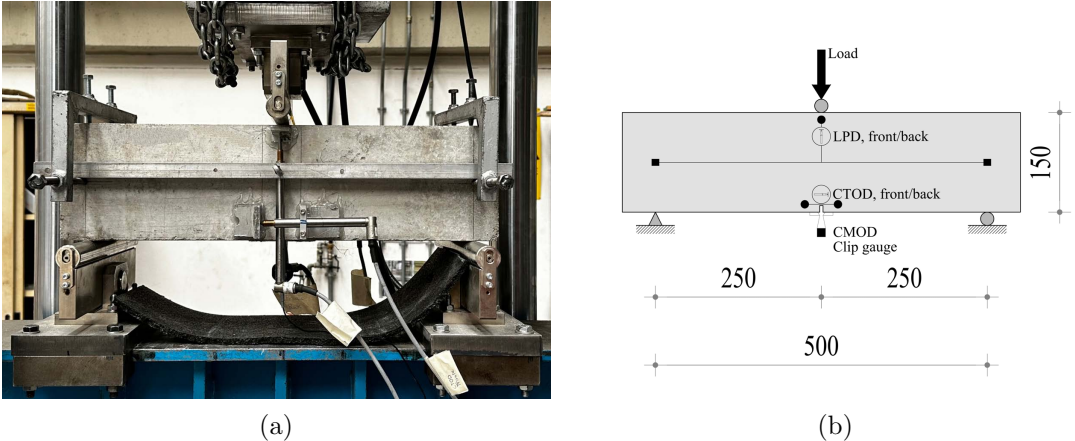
Three-point bending notched beam test according to EN 14651 [7]: (a) Test set-up; (b) Instrumentation details (dimensions in mm).
